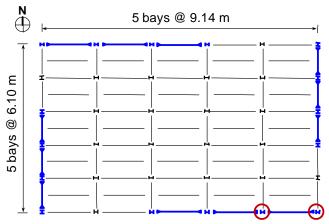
Plan layout for steel IMF building. Perimeter moment frames shown in heavy blue lines; circles indicate columns removed dynamically under service loads.
